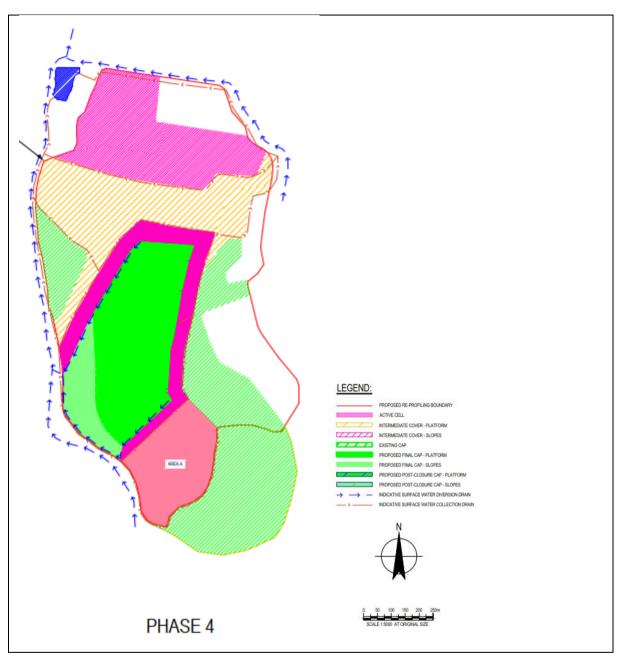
Re-profiling staging (Source: GHD, Proposed Reprofiling Development Plan, 3 July 2015, Appendix D LHRRP OEMP)
